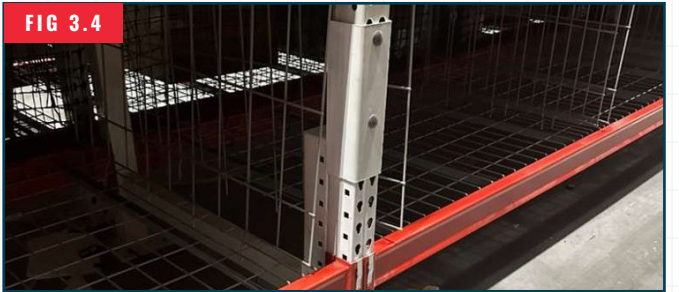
The finished engineered repair: a replacement column section bolted in, restoring full rating without a teardown. The repair-vs-replace point in the text, shown.
